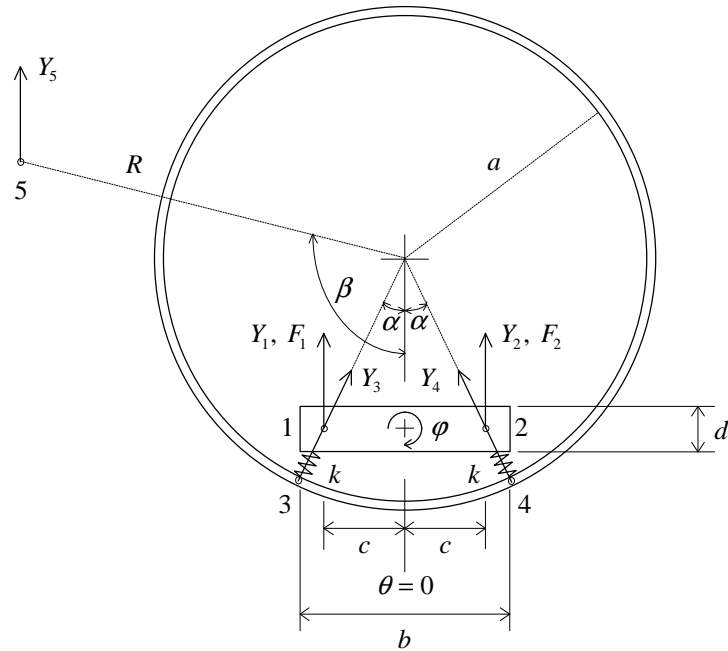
Tunnel cross-section showing how a torsional slab beam is joined to the tunnel invert along two longitudinal lines between the beam at 1 and 2 and the invert at 3 and 4.
